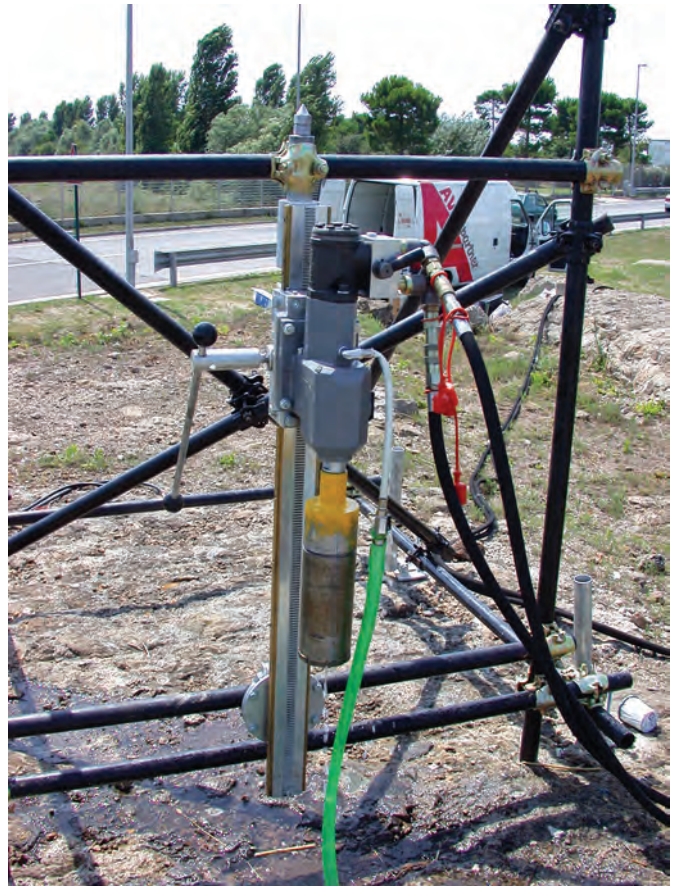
Drill motor unit mounted on Cordiam M60 rack clamped to scaffold frame.
